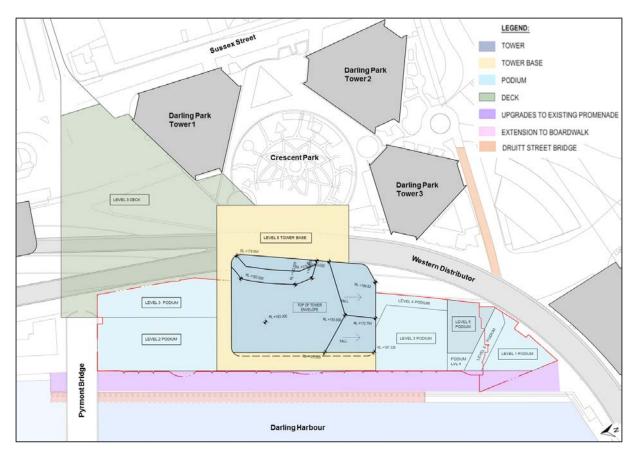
| Components and layout of the building envelope (Base source: Applicant's RtS)
